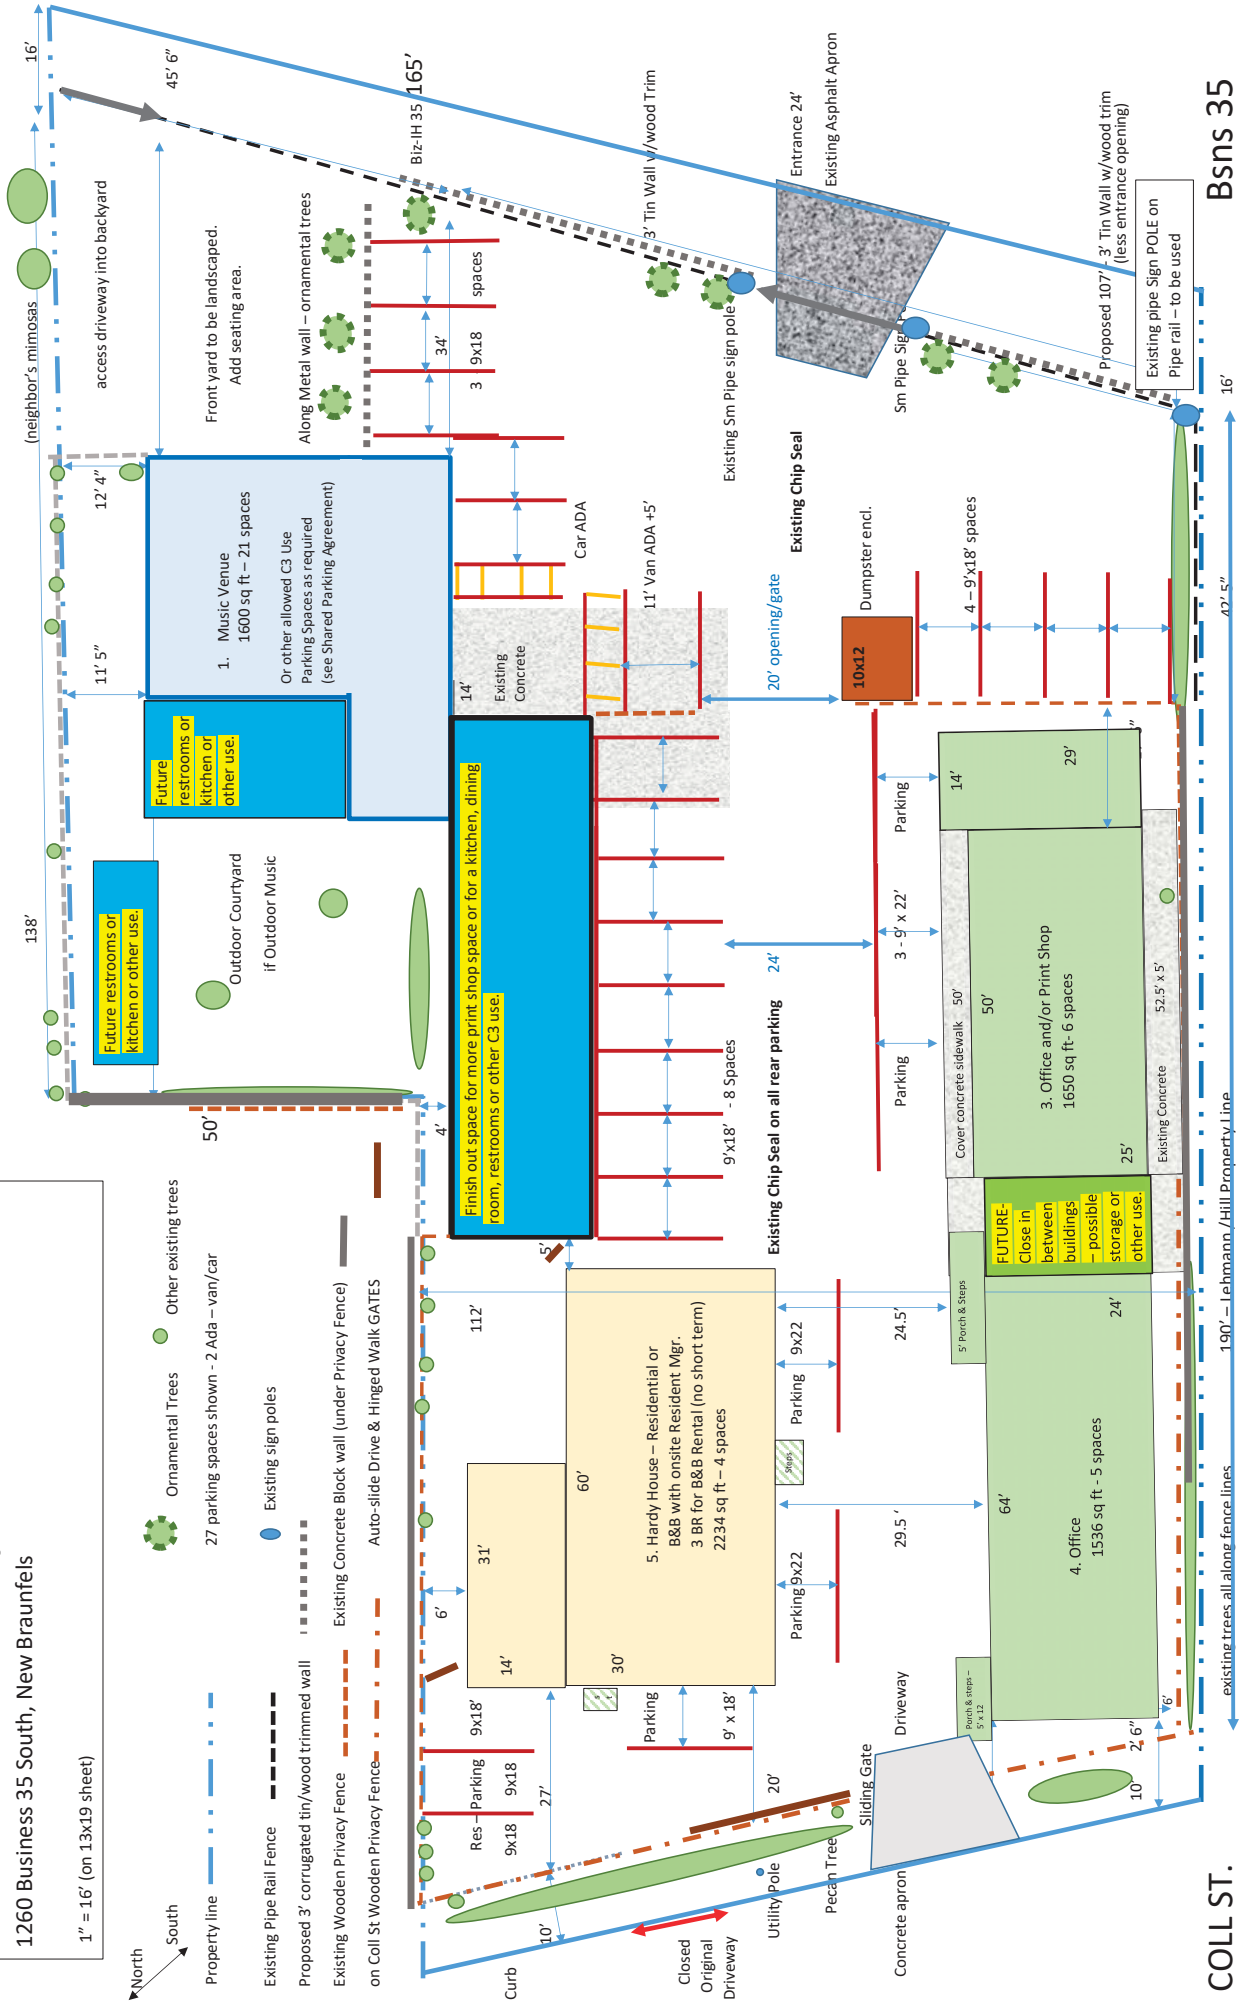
EXHIBIT E – ALTERNATIVE/FUTURE SITE PLAN B
